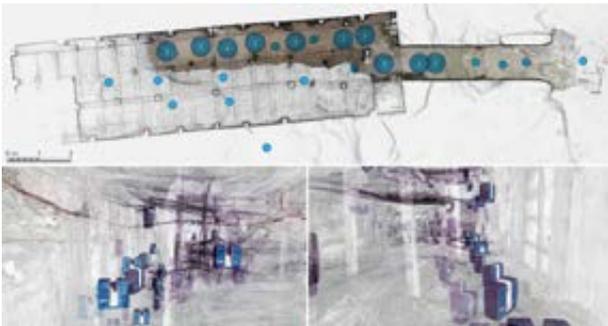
The cave shelter of the Scorluzzino: plan and elevation. S.A.B.E. ©.
